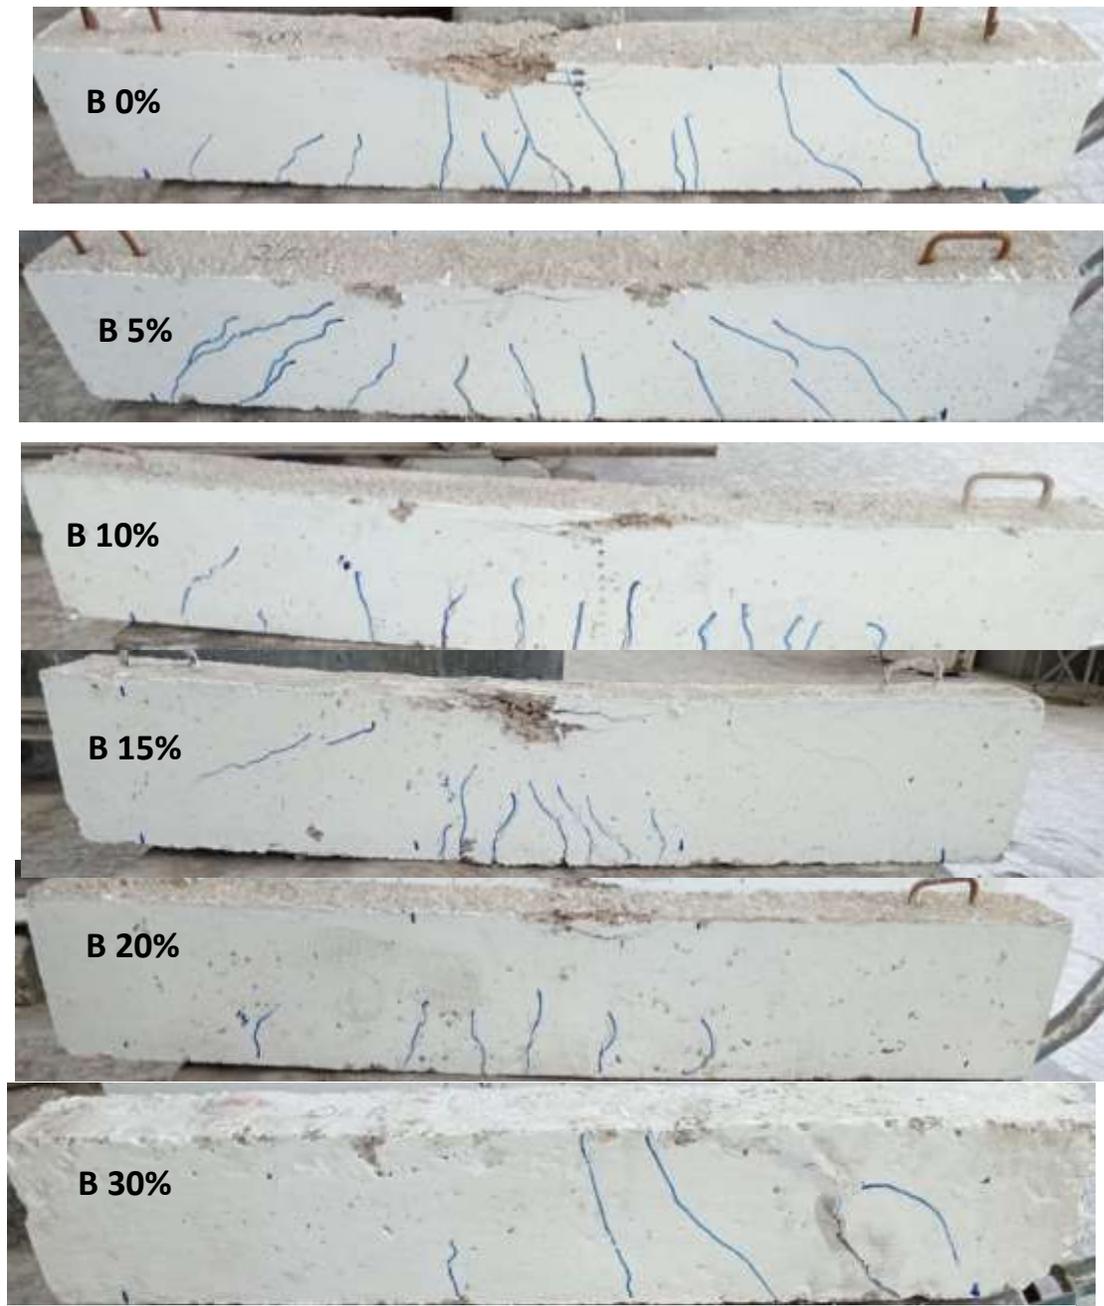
Cracks pattern for beams specimens containing PET as a sand replacement
